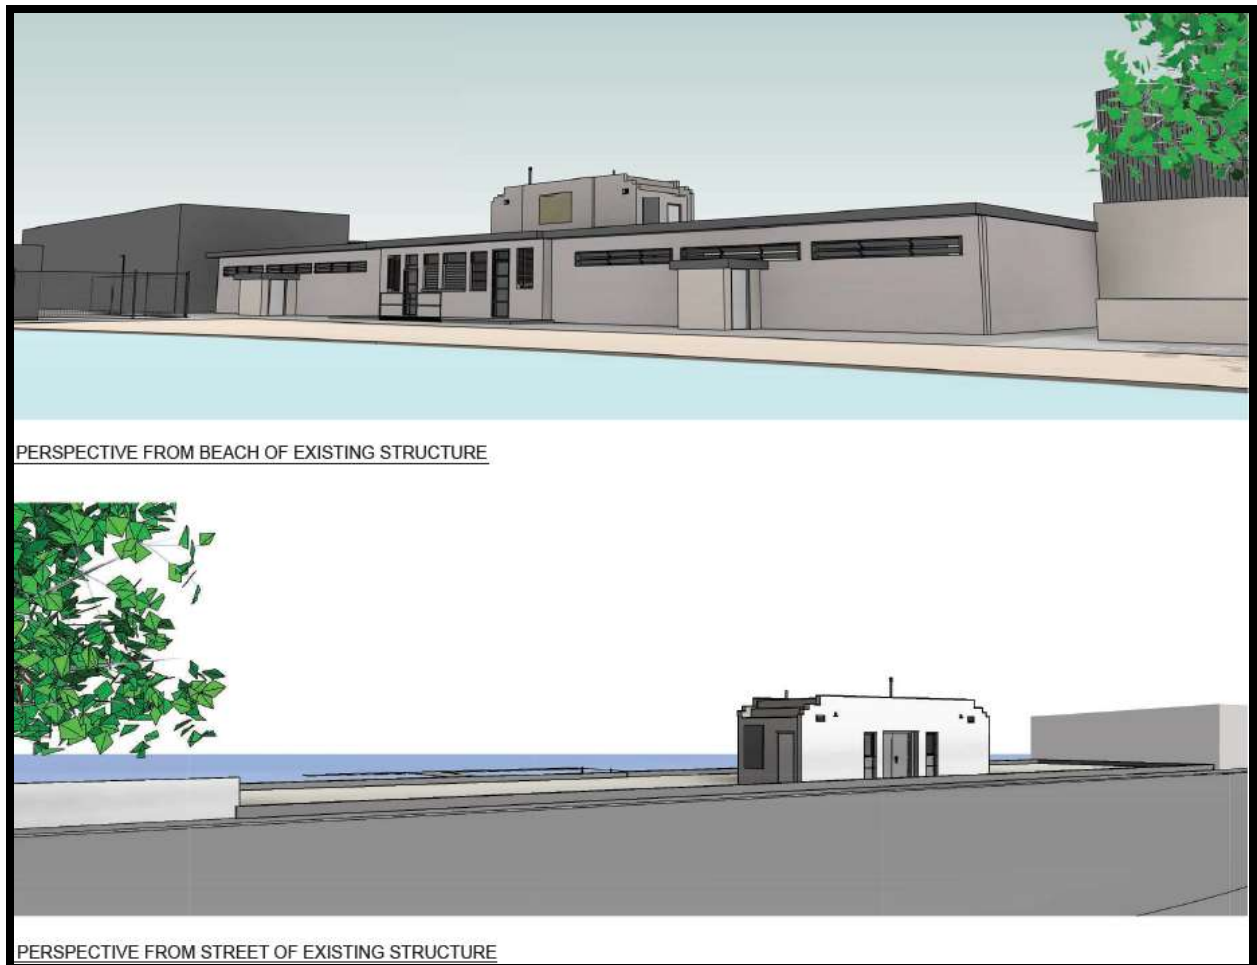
3D perspectives of the existing Bathers Pavilion structure (courtesy Conybeare Morrison International, 2020)
